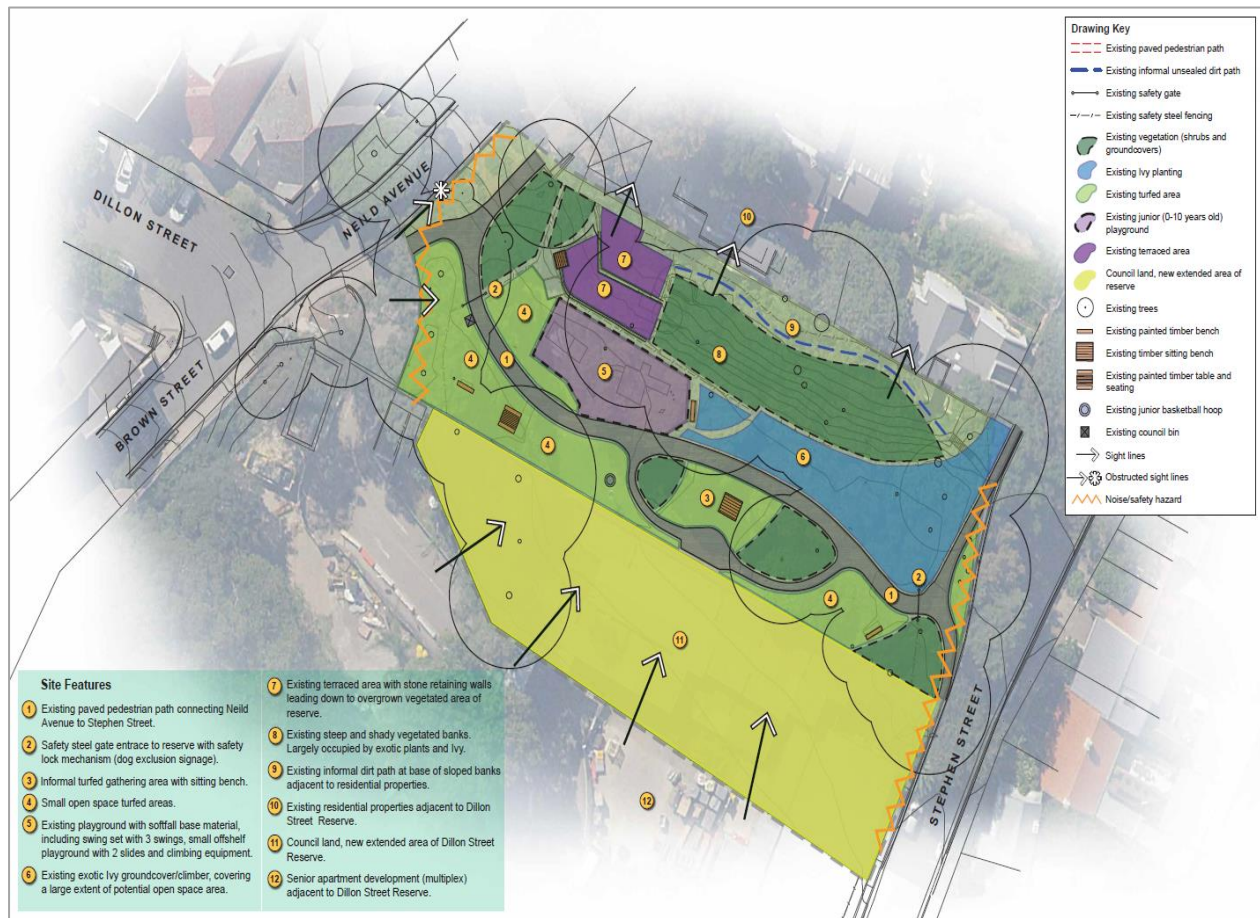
Dillon Street Reserve Upgrade - Site Analysis Plan (Source: Woollahra Council / Thompson Berril Landscape Design)
